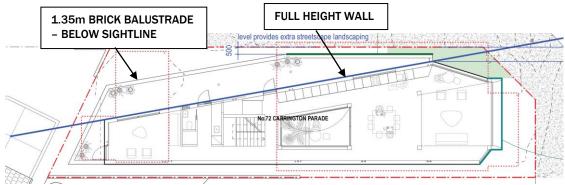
the proposed extent of 1st floor level has northern setbacks ranging from 5.05m to 1.0m to provide an improved view sight-line (as shown below and explained on plan sheets - DA 002, 003, and 004)
